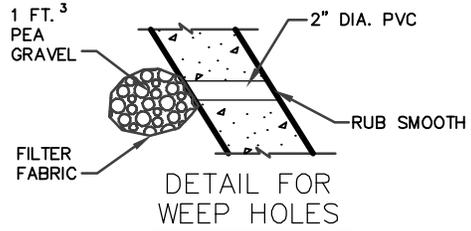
DETAILS OF REINFORCED CONCRETE CHANNEL LINER
